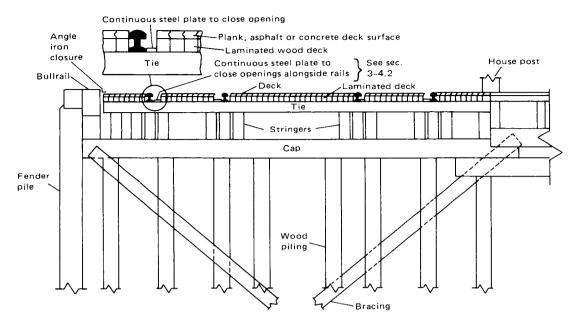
Illustration of a Combustible Substructure with Railroad Tracks.
